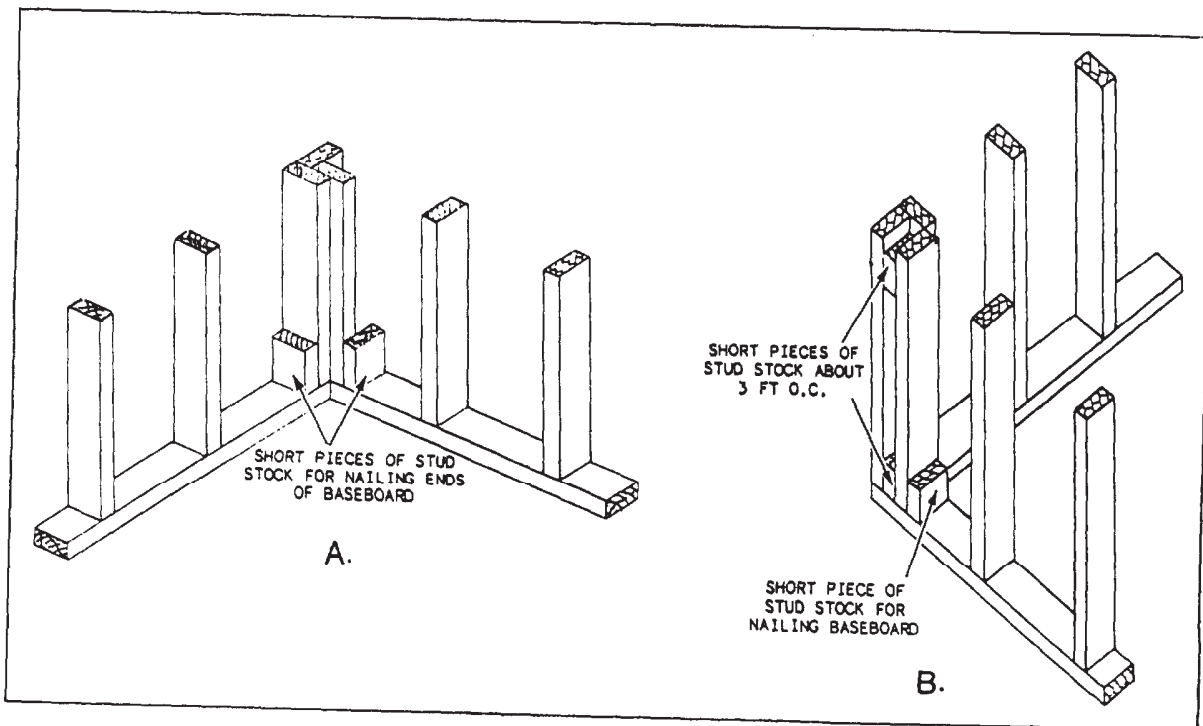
Typical examples of corner posts: A. Simplest type; B. More solid type.
